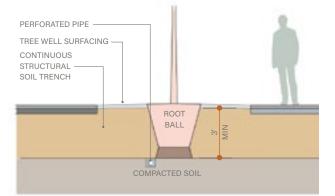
Typical Section of Sand-Based Structural Soil
